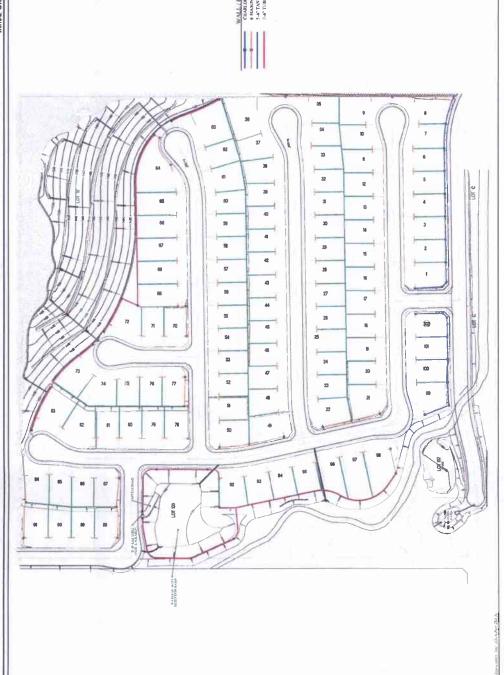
PRELIMINARY WALL AND FENCE PLAN
